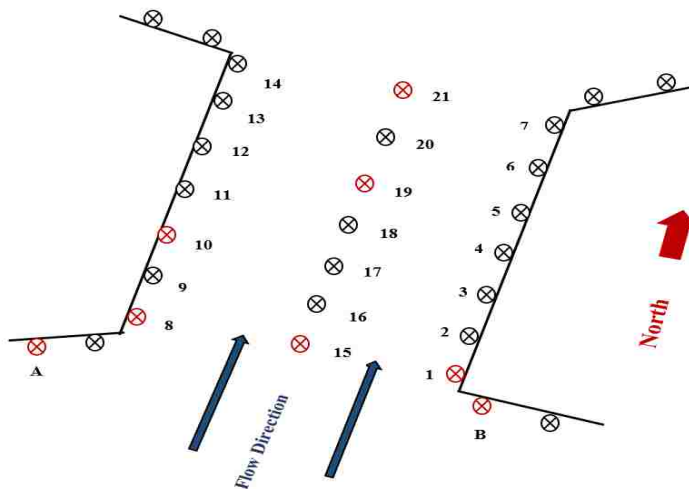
Piles Distributed Plan and Locations of Tested Piles of Bridge #1190
